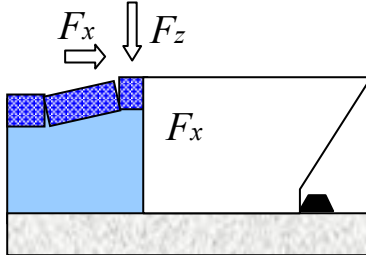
(c) If the bending effort particularly high, a second crack could be formed upstream of first crack.
